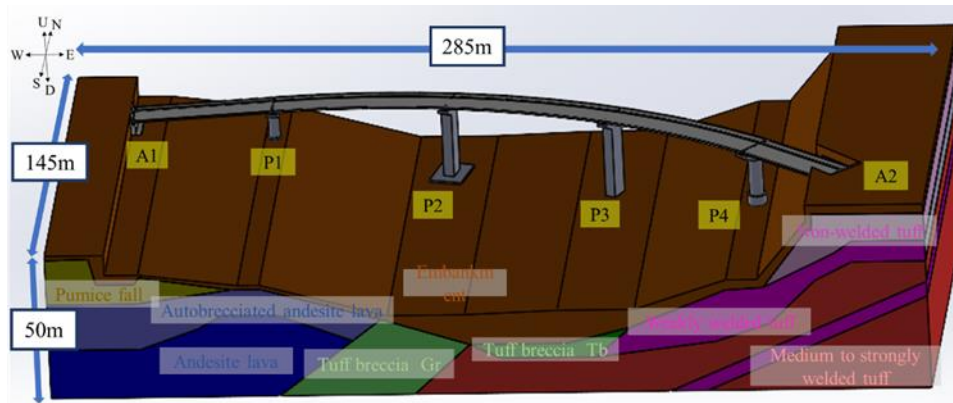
3D computer-aided design model of bridge structure-underground interconnected system
